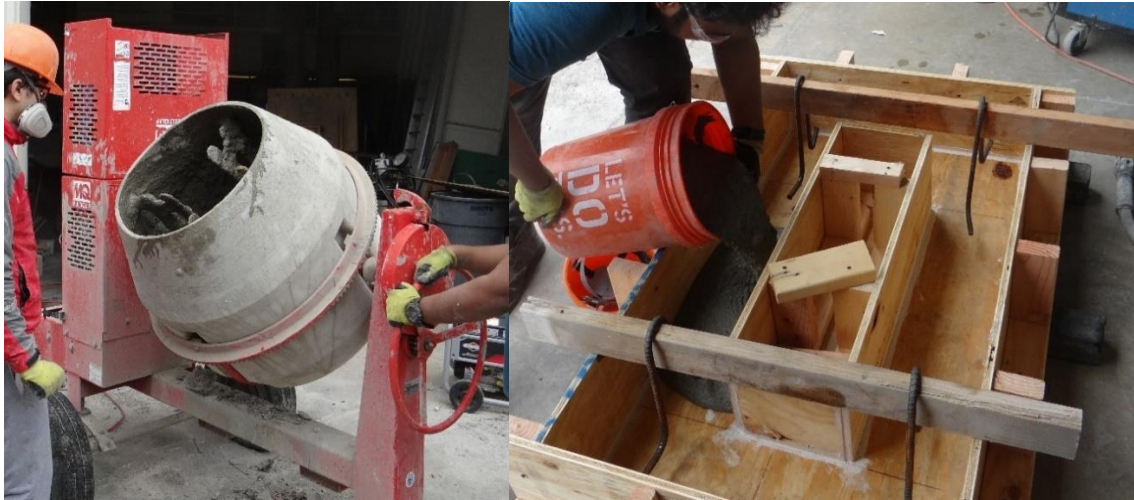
17 In-lab concrete mixing is shown in top photo and casting for the outer hollow slab is shown in the bottom photo.
